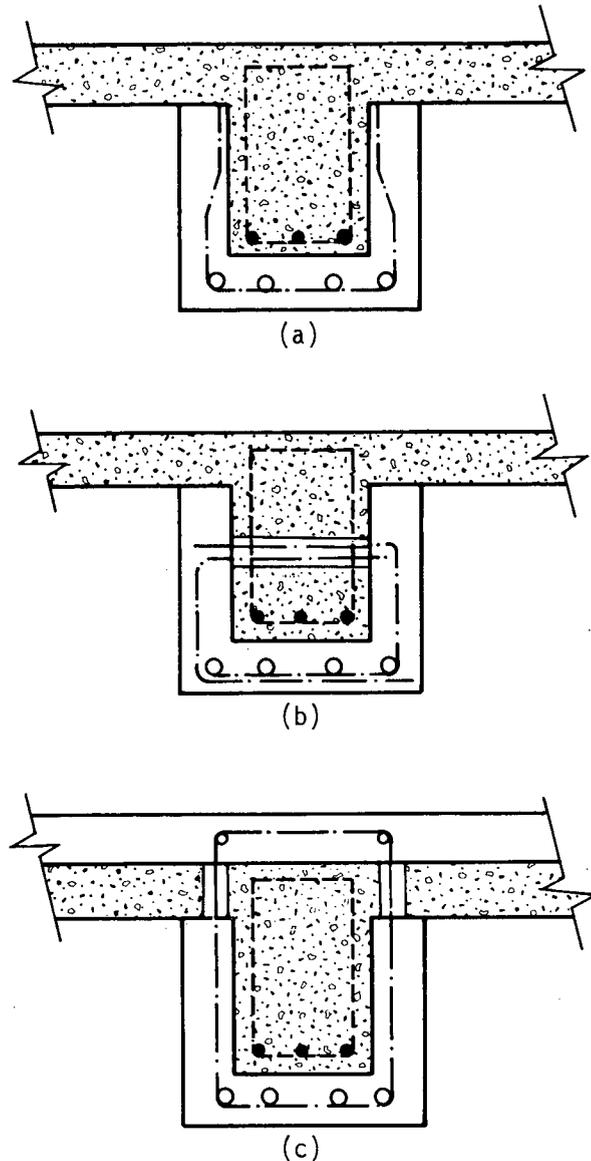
Techniques for increasing the flexural capacity of reinforced concrete beams with reinforced concrete sleeves.
